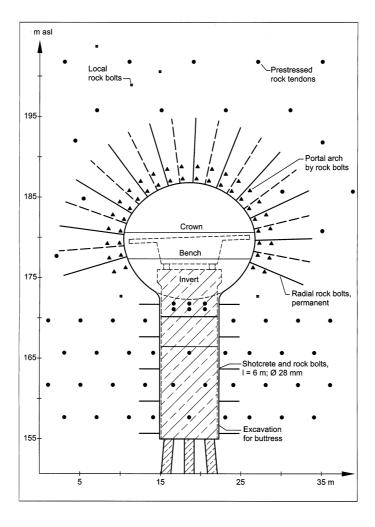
Tunnel Dölzschen, cross section with preliminary tunnel support and excavation for the buttress of the adjoining bridge.
